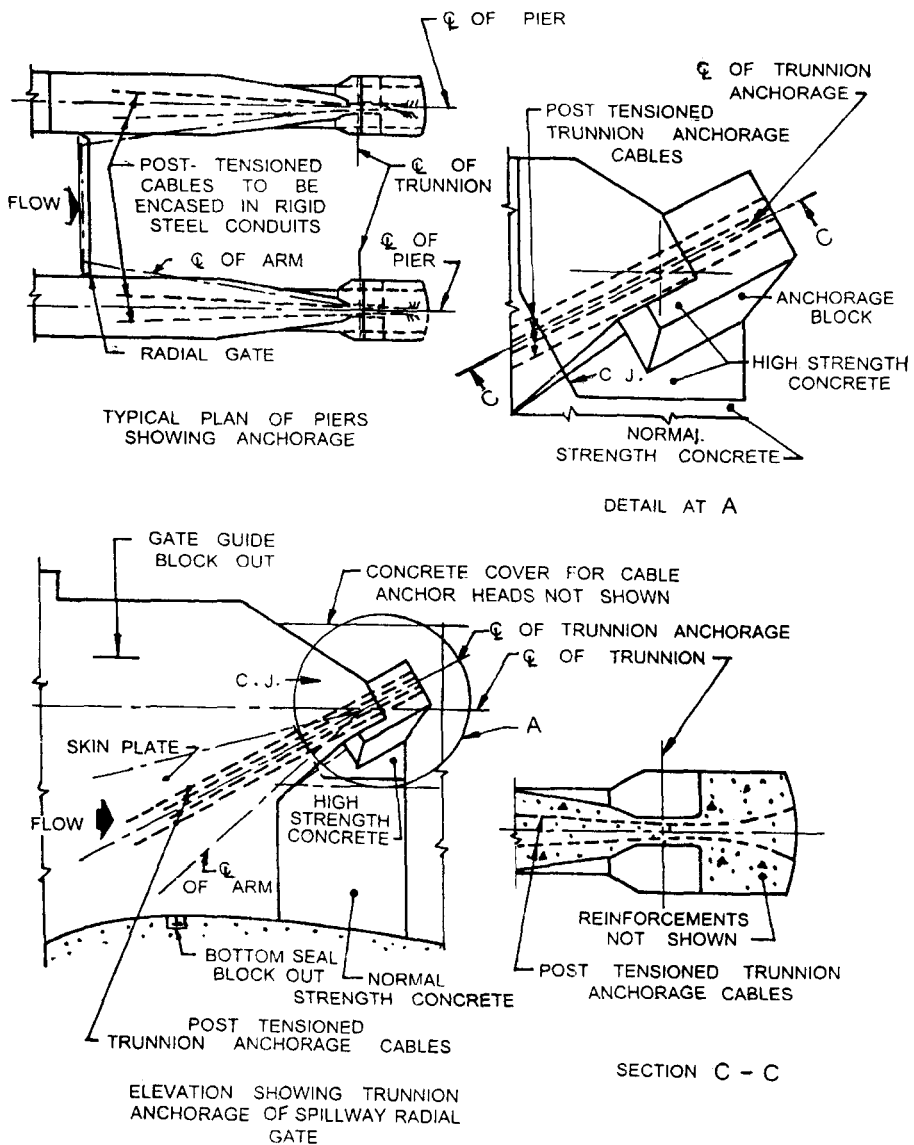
ELEVATION OF TRUNNION ANCHORAGE OF SPILLWAY RADIAL GATE
